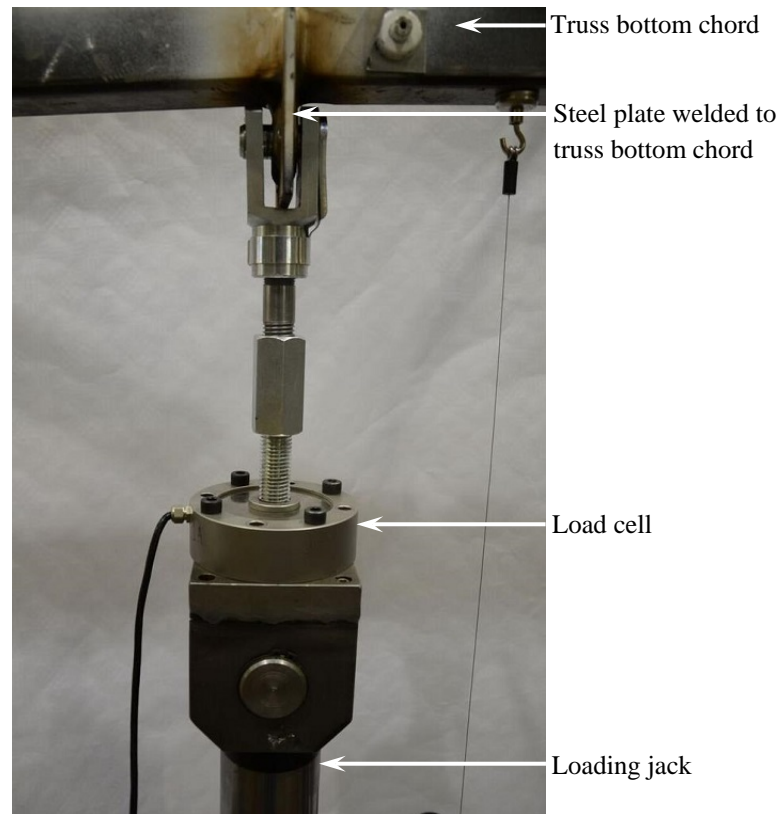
Detail of the loading jack to truss connection via steel plate.
